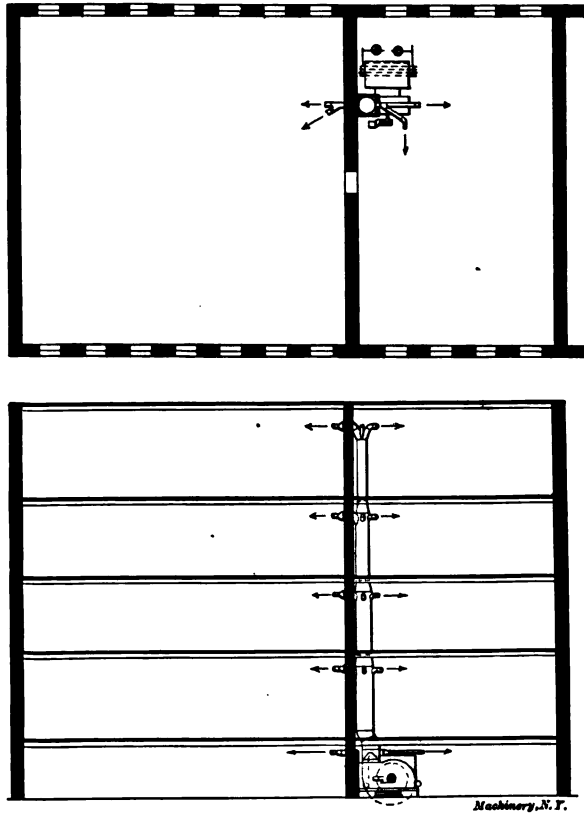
Simple Arrangement of Heating Installation in a Small Building
